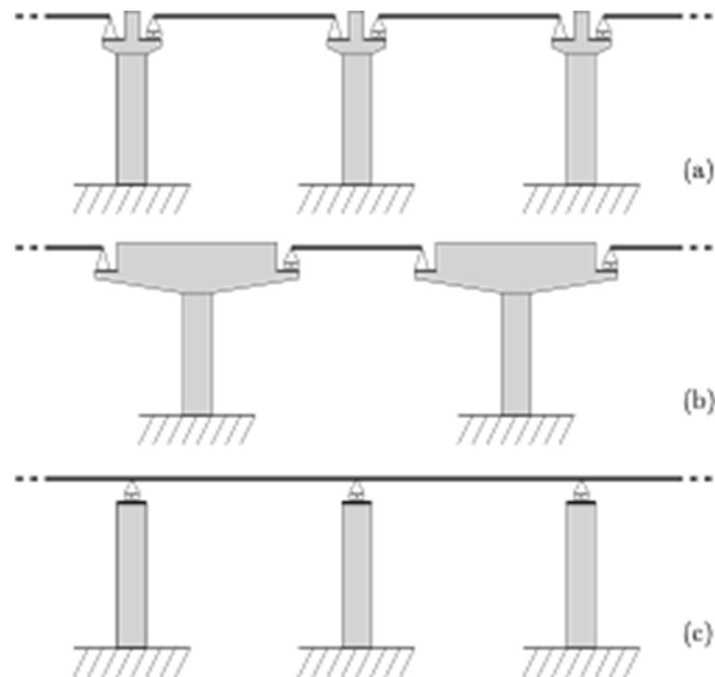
Sketch of typical beam arrangement in existing concrete bridges
